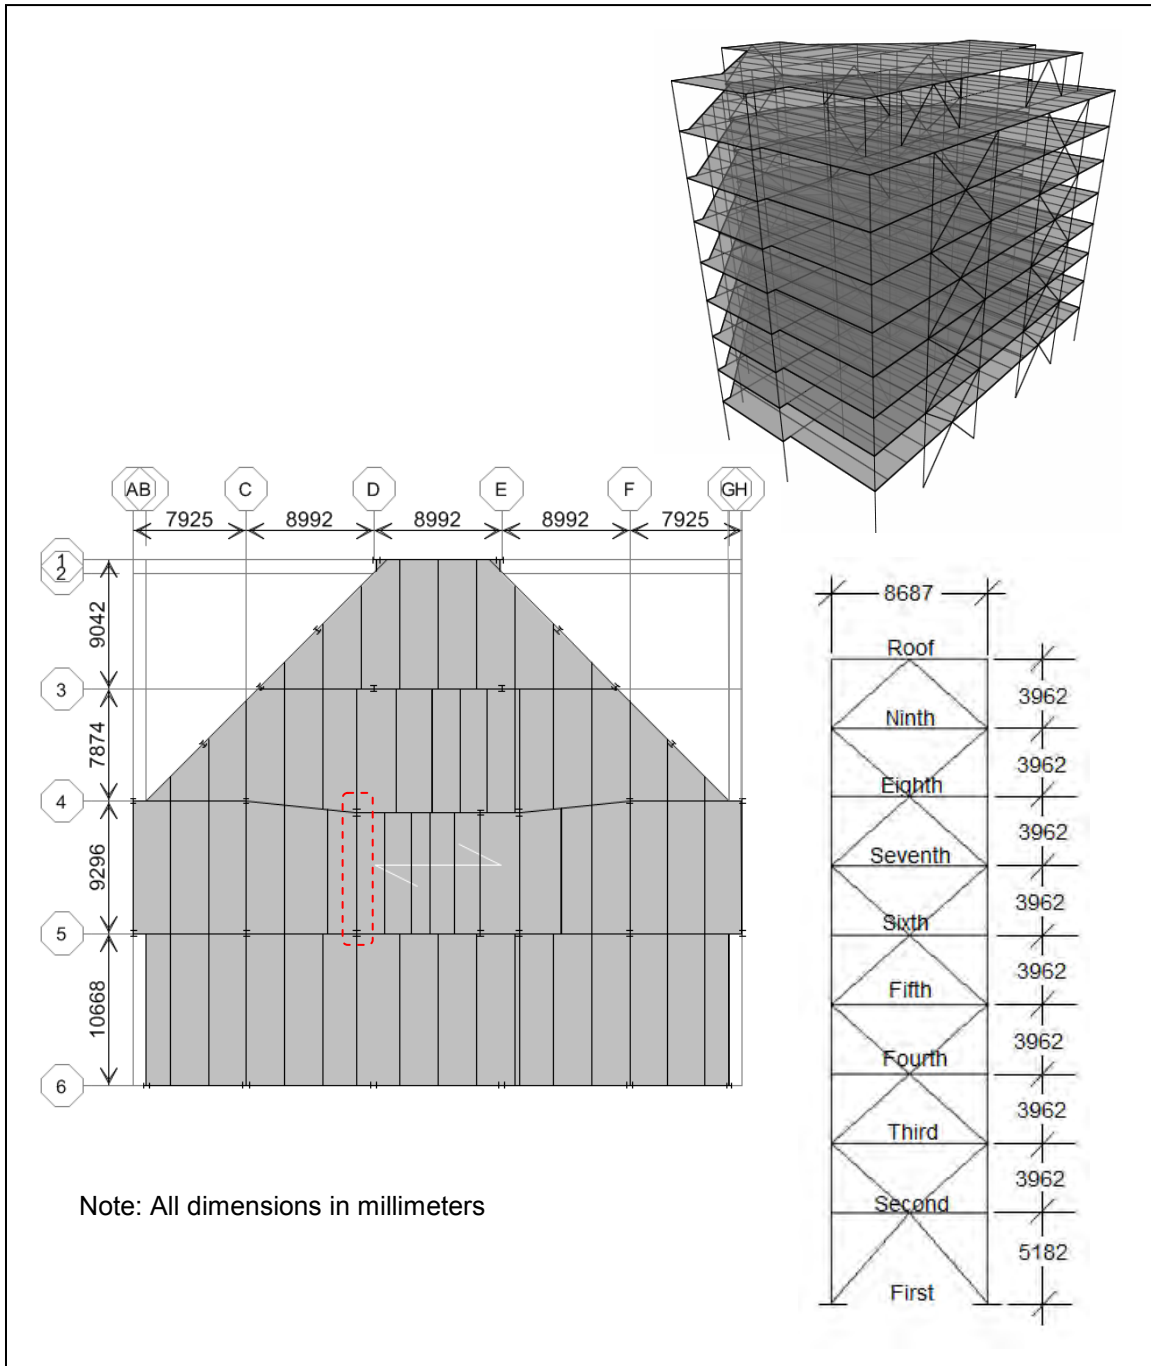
Building BF-5 3D, Plan and Section at Gridline D
